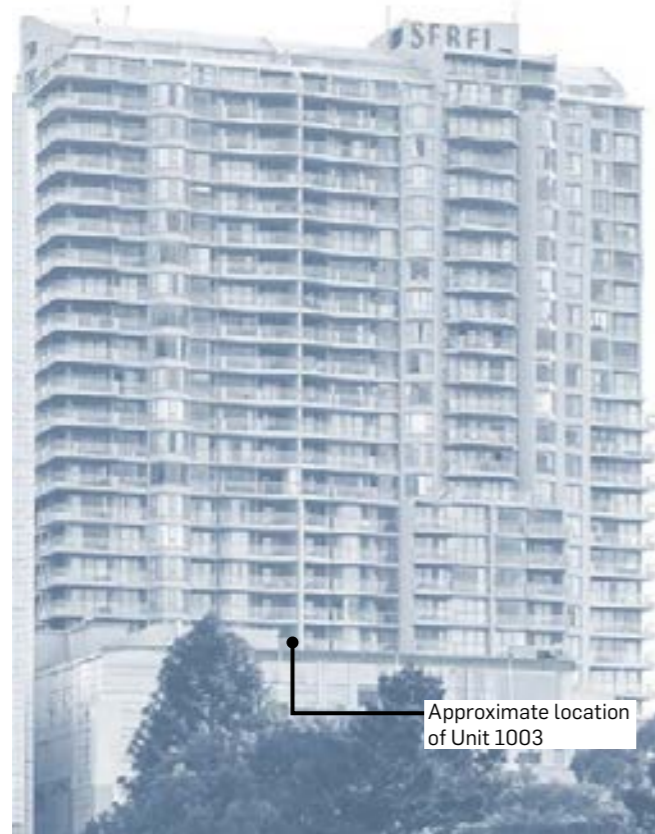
VIEW LOCATION MAP - ELEVATION
